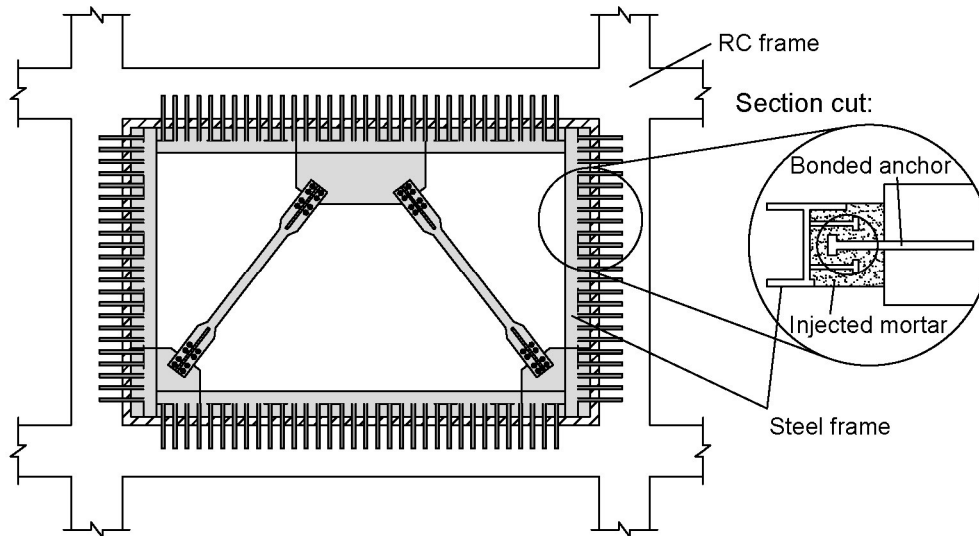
Schematic depiction of a steel bracing indirectly fixed to the primary RC frame structure by means of an additional steel frame. Based on Usami et al. (1988) and Ohishi et al. (1988).
